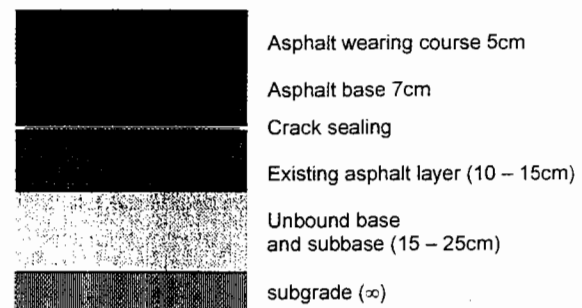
Typical cross section of Rhodes airport runway pavement after rehabilitation
